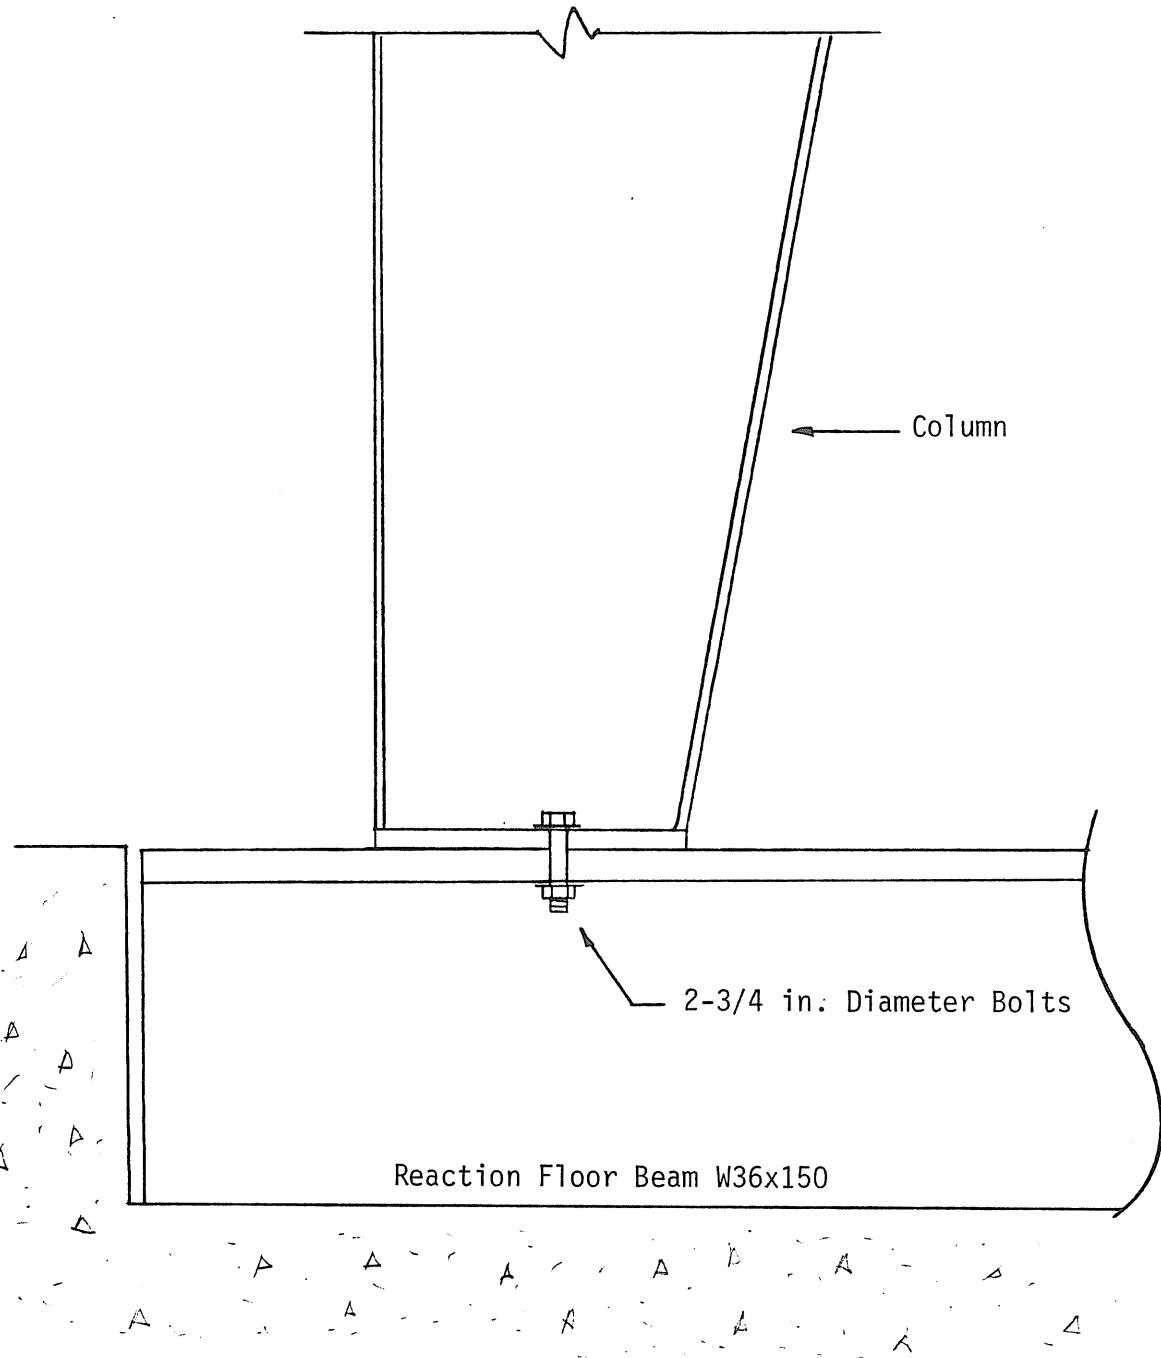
DETAILS OF COLUMN-TO-REACTION FLOOR CONNECTION
